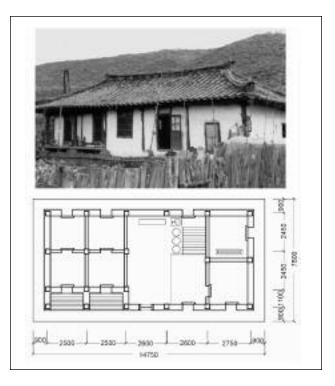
The Li residence in Changcai Village, built in the 1910s. Note the external colonnaded porch has shrunk in size and is unconnected to the gudul room.
